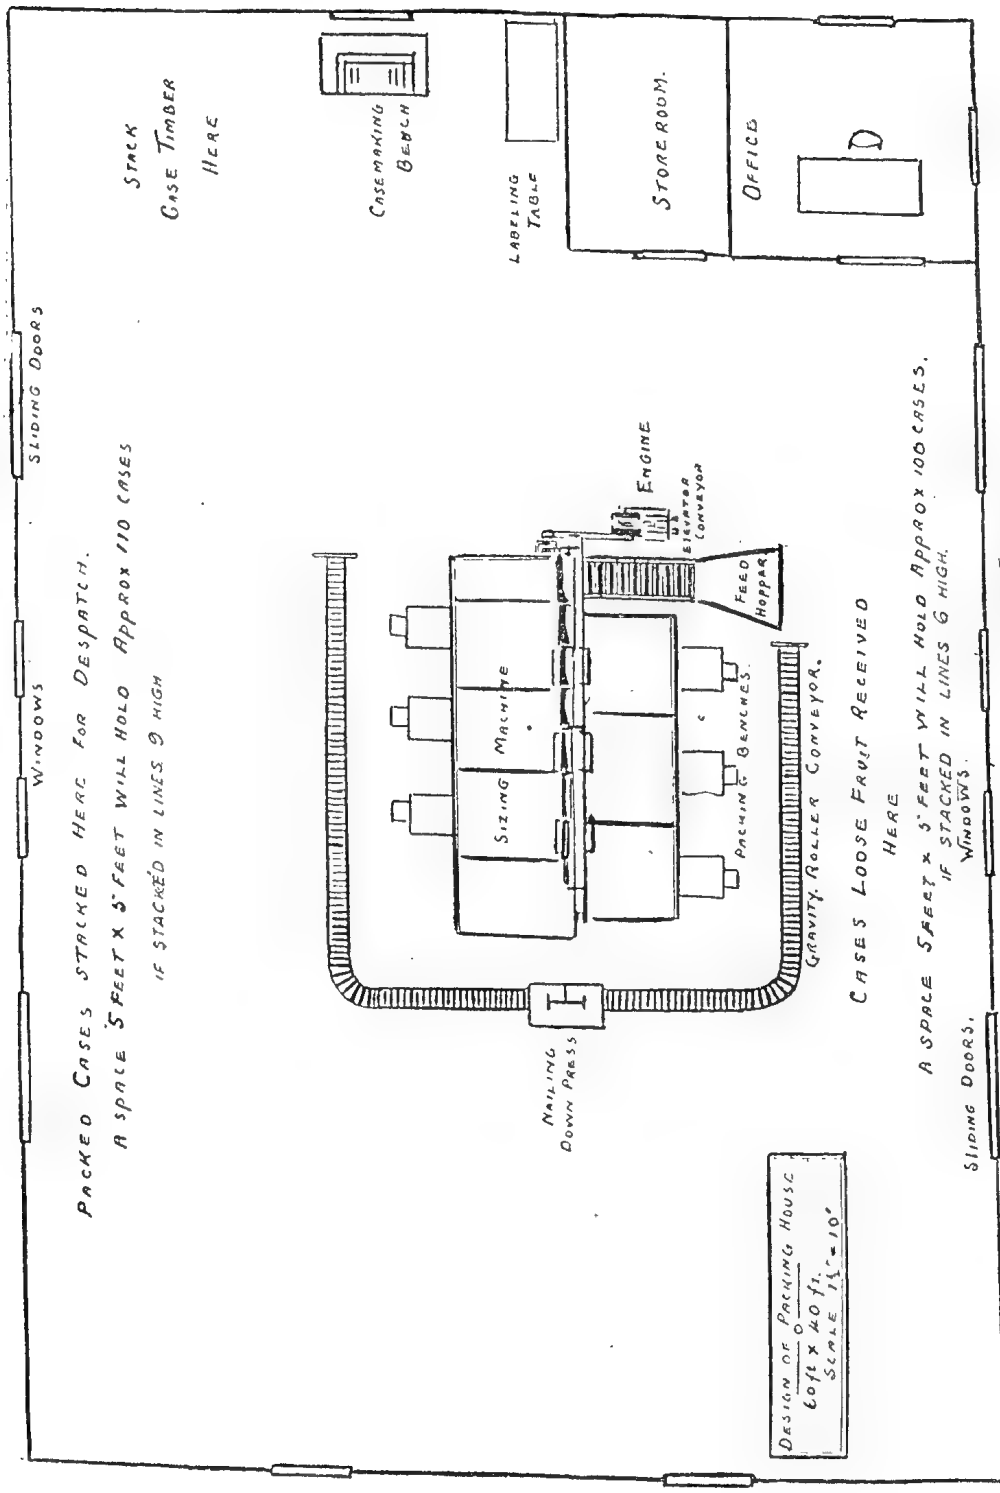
(Fig. 1).—PACKING SHED LAYOUT.
